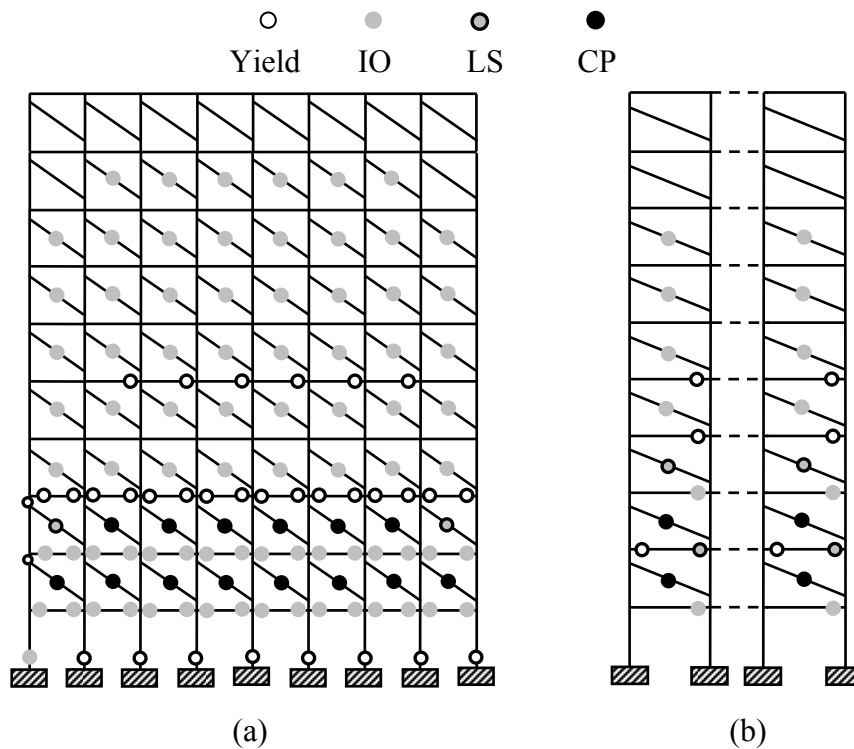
Collapse mechanism of ten storey RC infilled frame buildings with open ground storey, designed as SMRF without considering provisions of BIS (2002) for open ground storey: (a) typical longitudinal frame; (b) typical transverse frame.
